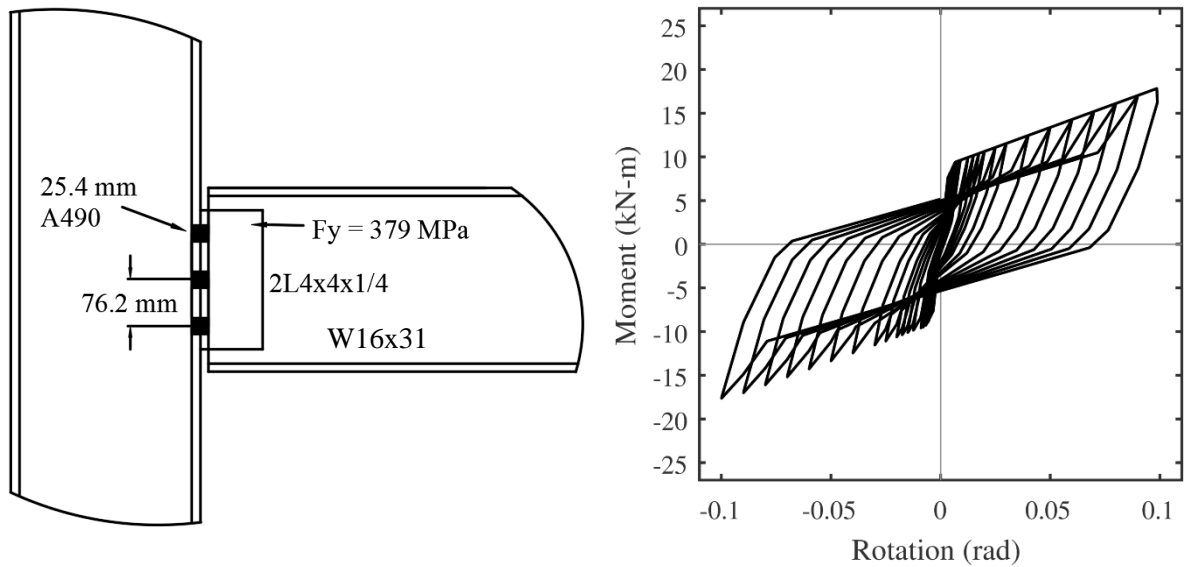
Connection detail and moment-rotation hysteresis for gravity beam-column connections in case study buildings.
